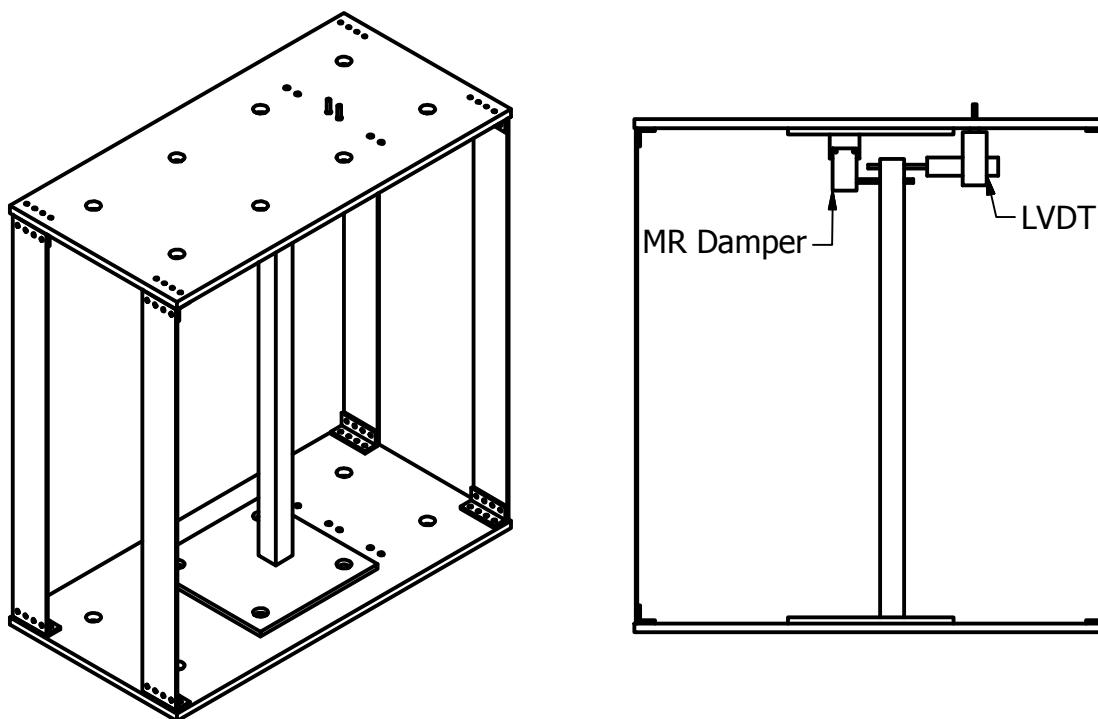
Drawings for the first story assembly of the shake table specimen.
